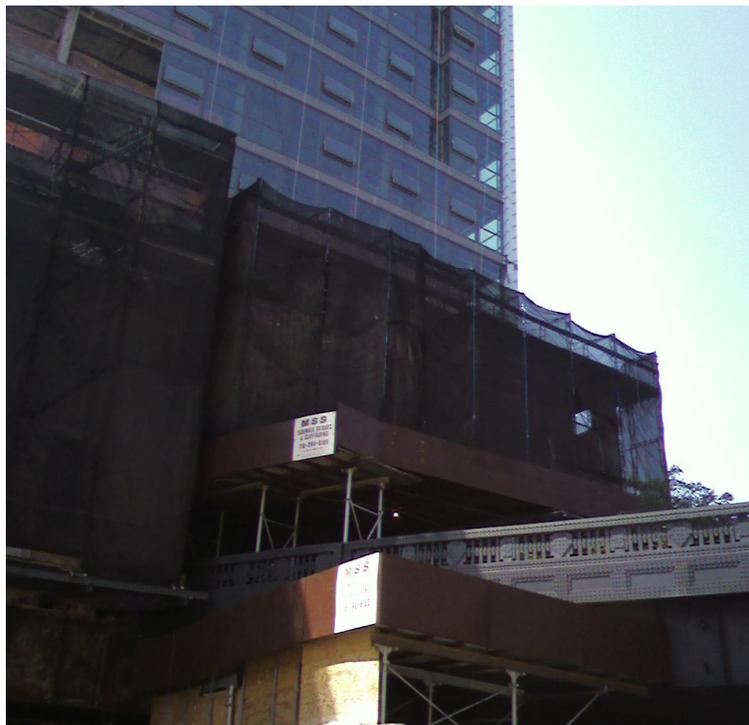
Highline building under construction immediately east of the Subject Property. View is toward the south from West 14<sup>th</sup> Street.
